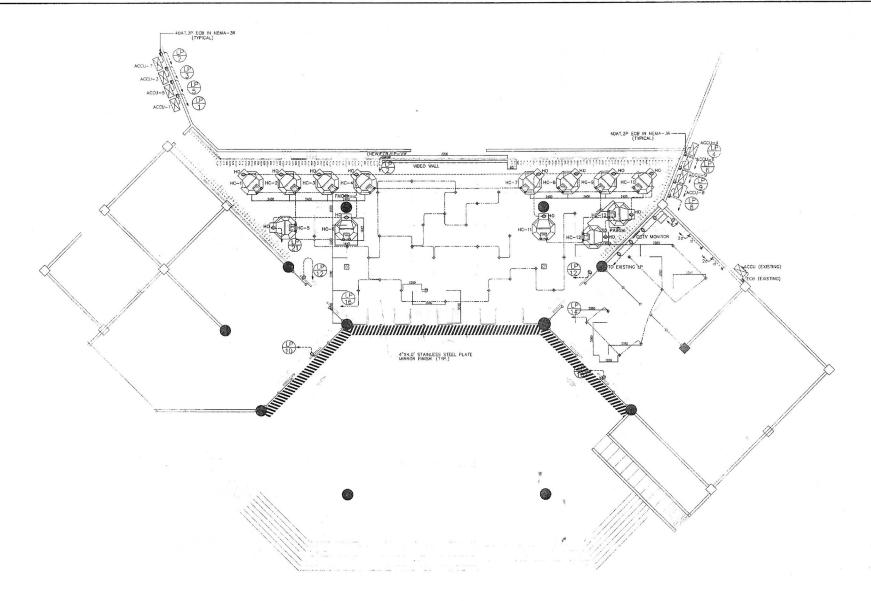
EXHIBIT GROUND FLOOR LIGHTING POWER & TELEPHONE LAYOUT PLAN
